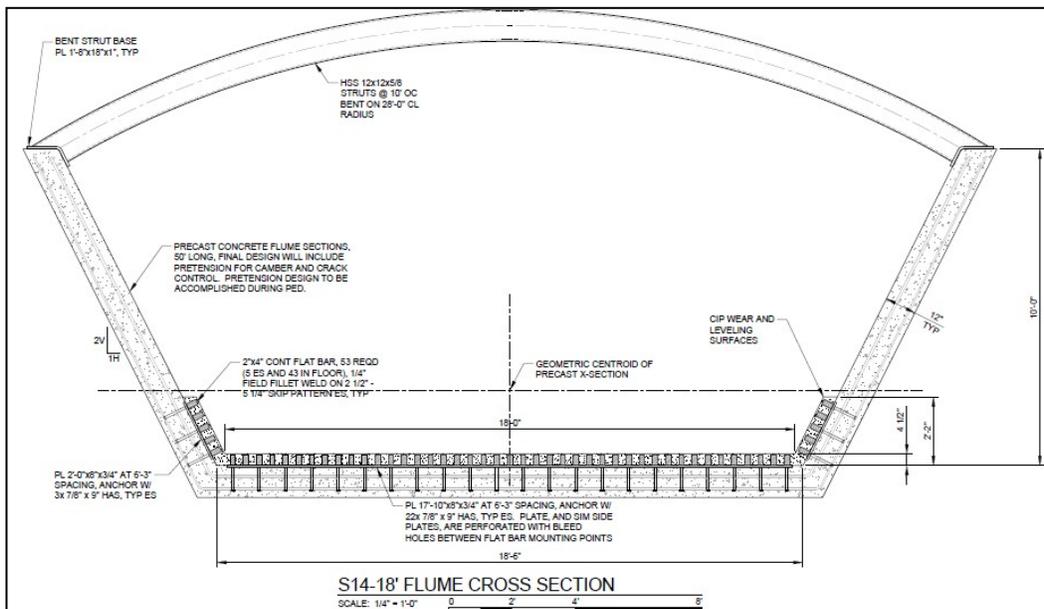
18 Foot Flume Cross Section (Note: 24 Foot Flume Cross-Section will be similar).
